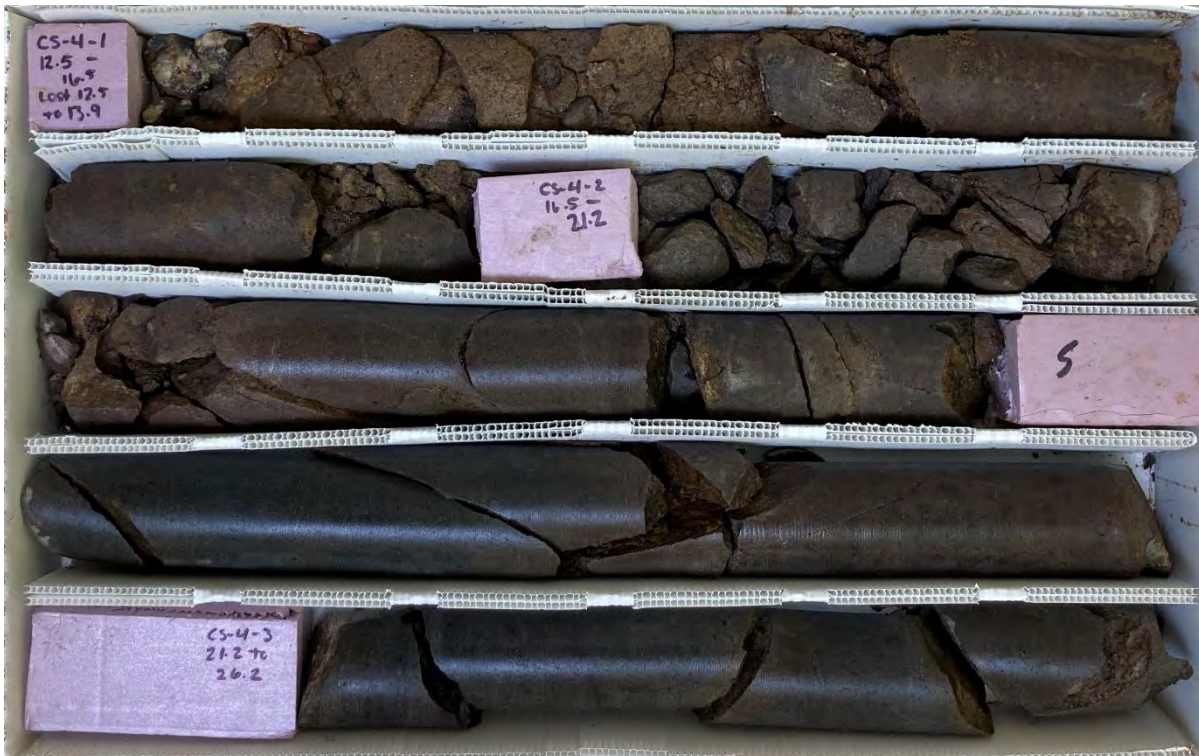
B. BH-4 from 12.5 to 23.0 ft - Box 1 of 3
